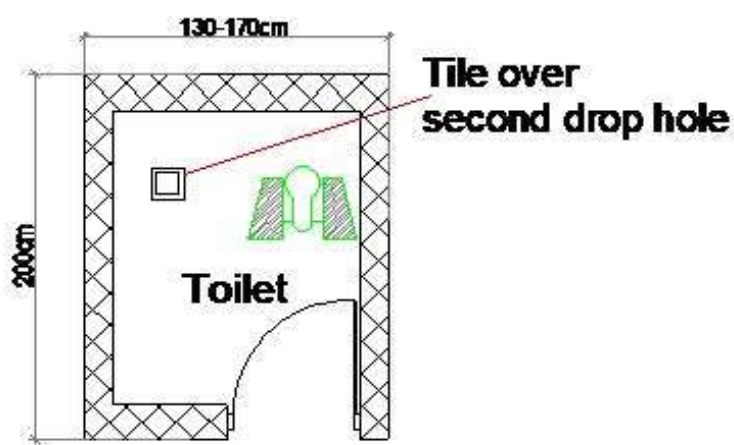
Floor (latrine seat) layout – alternating twin pit
